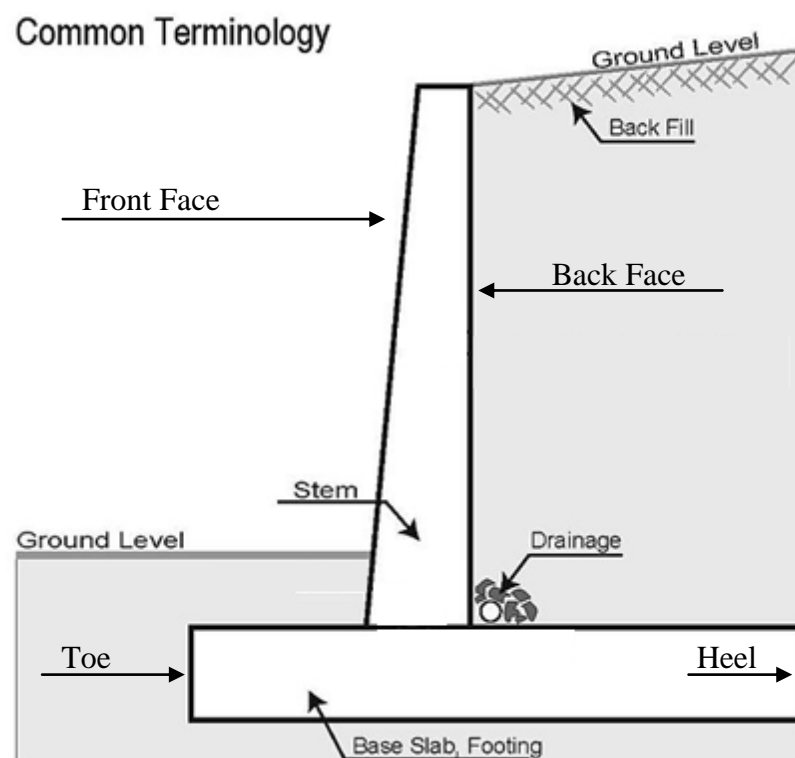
Cantilever retaining wall terminology (Denson, 2013)
